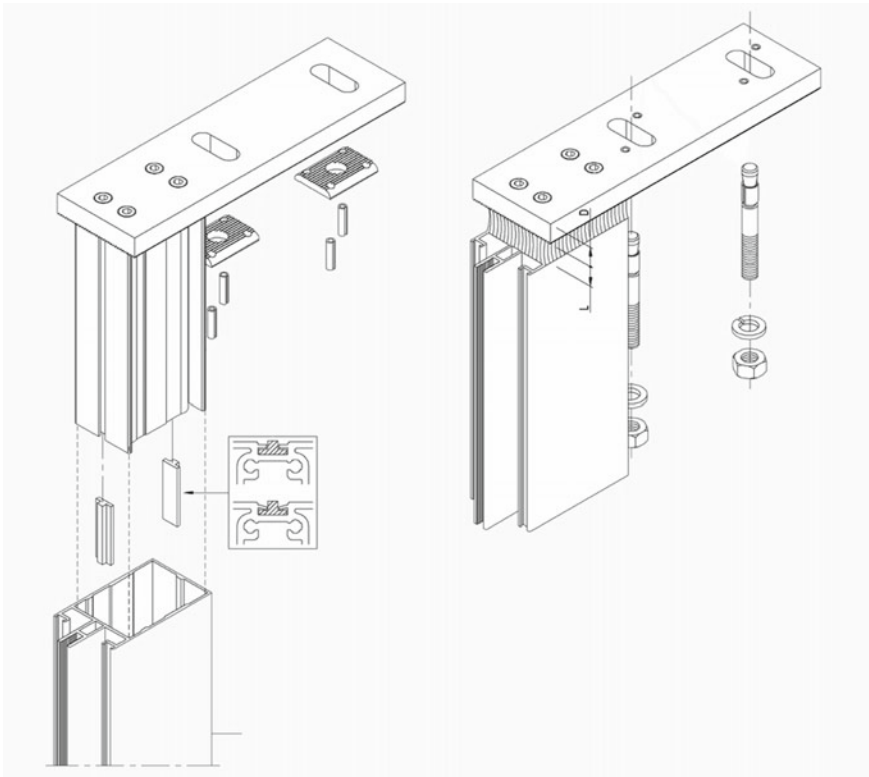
Brackets anchored to the structural ceiling by providing the tensile work of the fasteners and the spacing from the perimeter surface. © Courtesy of Reynaers
